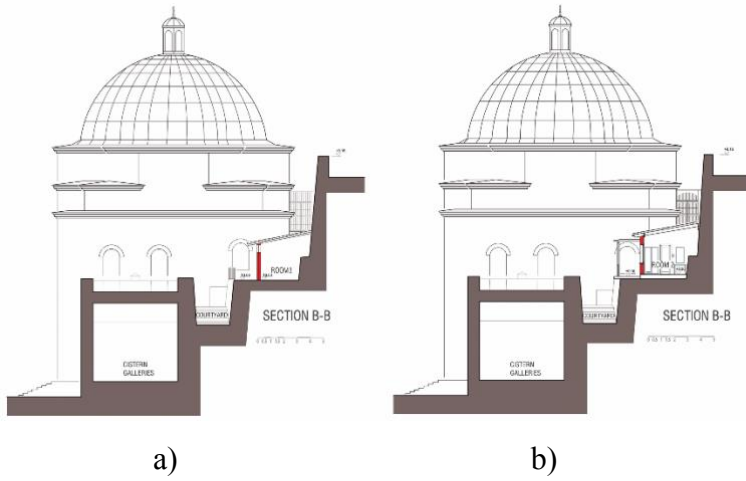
a) Section of Worker's Dormitory b) Section of Guest House (Archive of MSGSÜ Rectorate, Drawing: Dışkaya, H., Graphic Design: Eroğlu, İ.)
